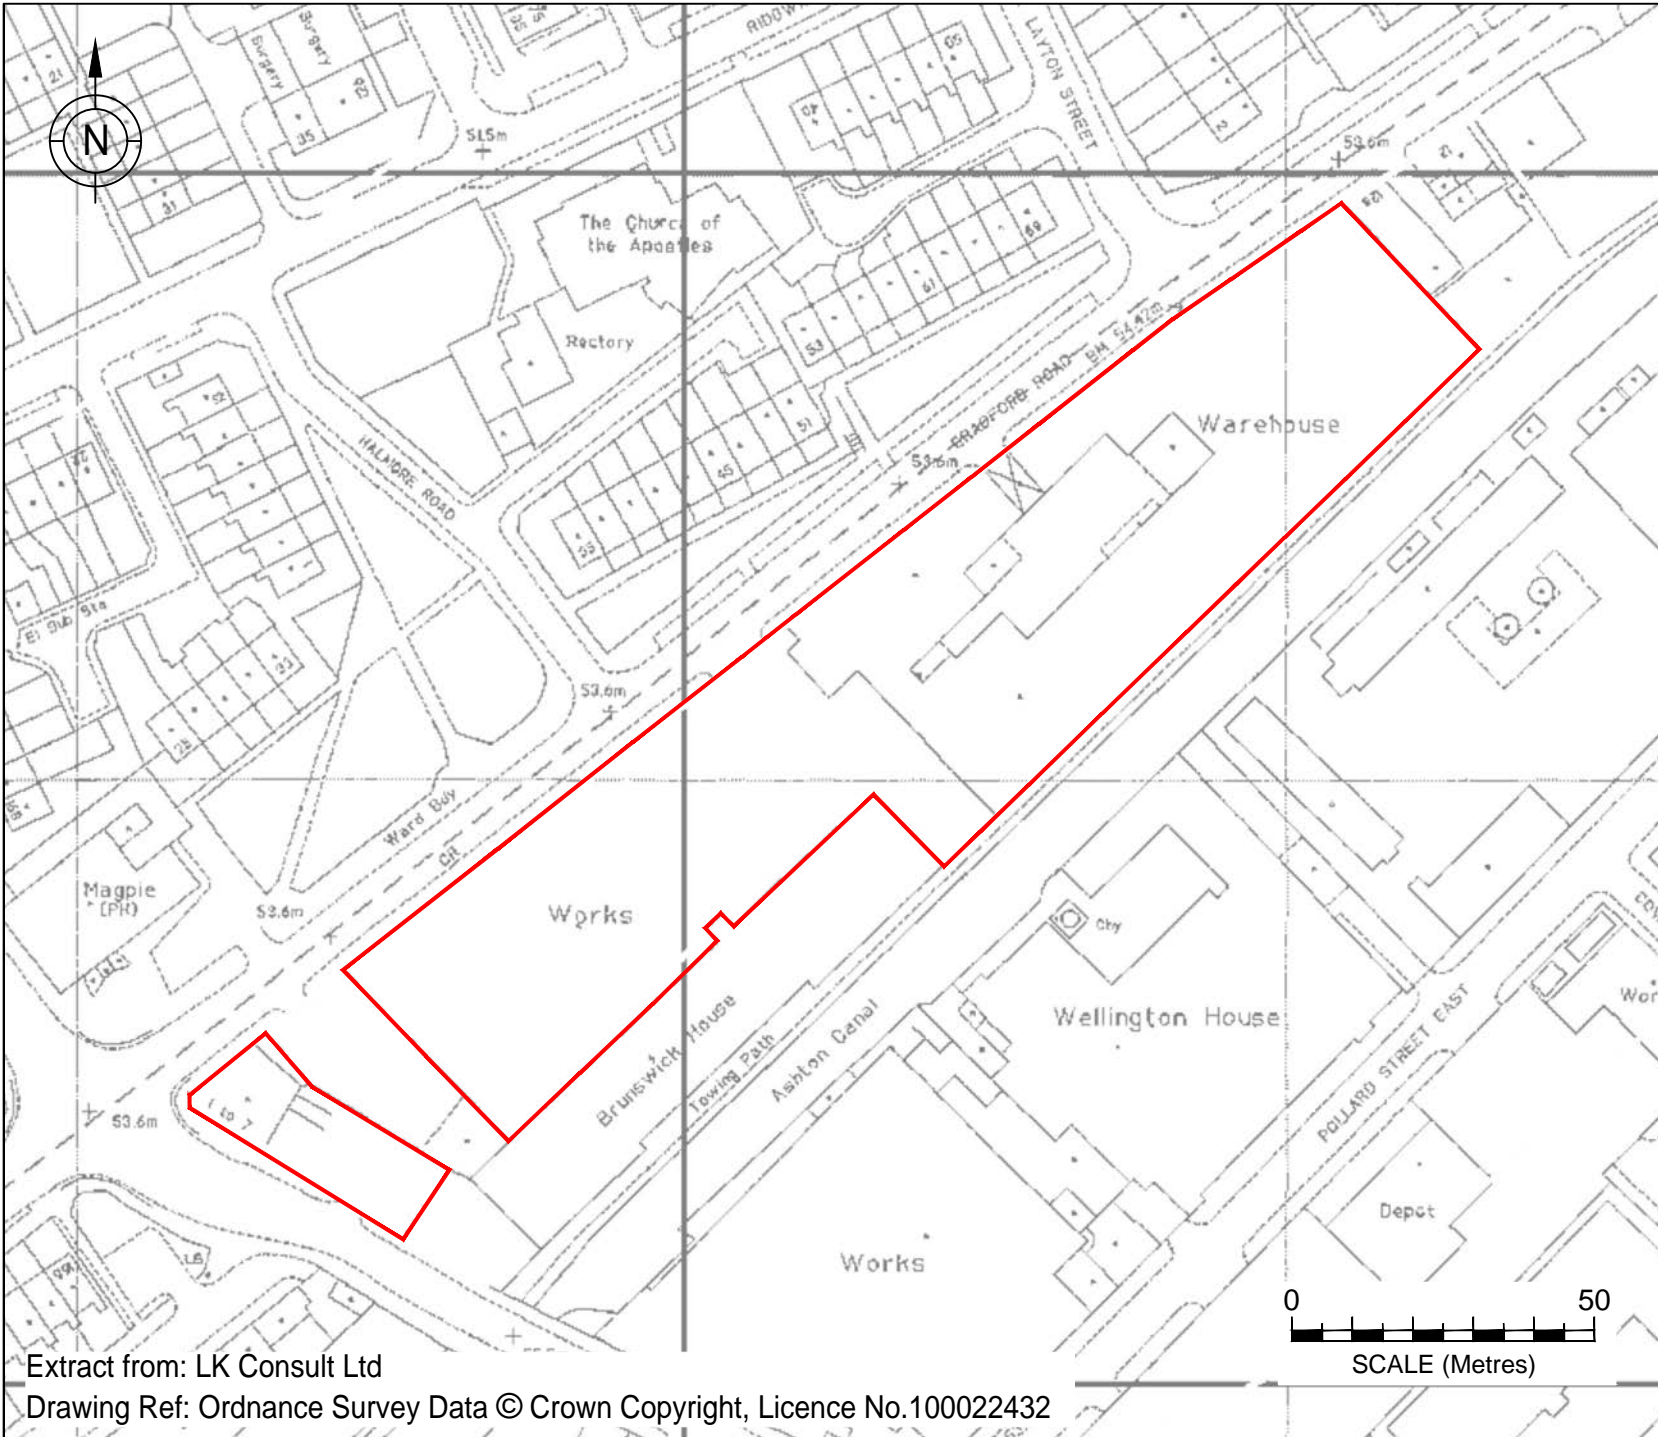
Site Location Plan, Brunswick Mill, Bradford Road, Manchester
